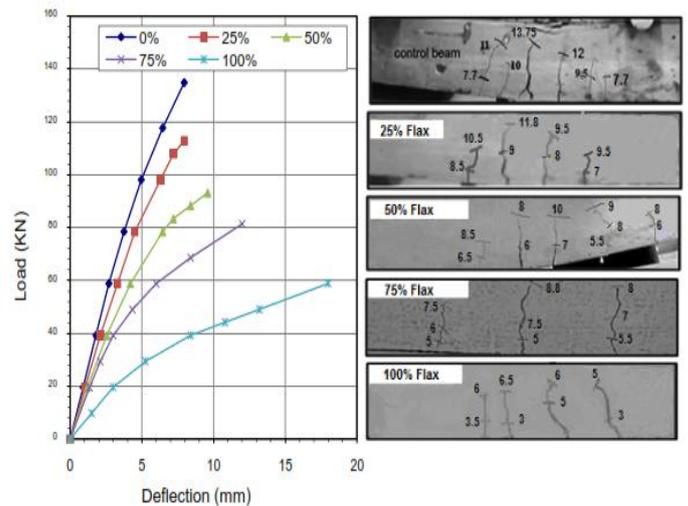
Load-deflection of beams reinforced with flax bars and cracking pattern for tested beams
